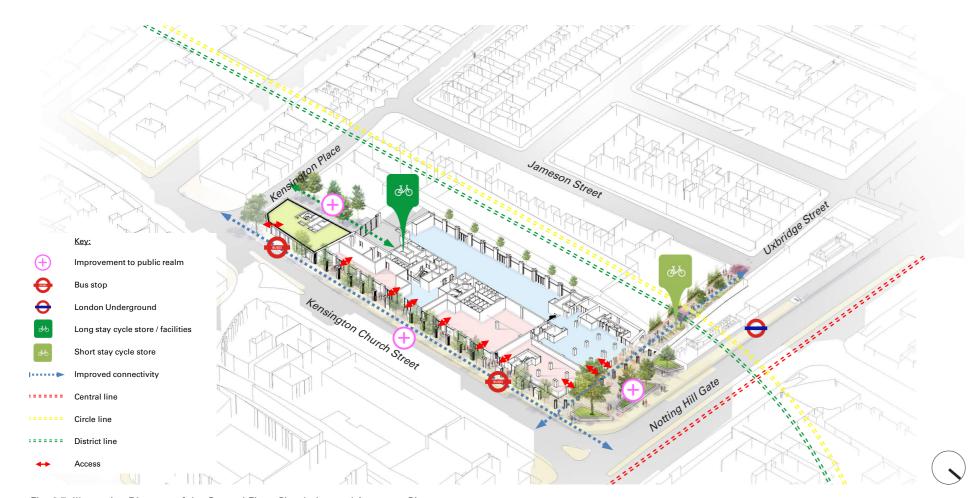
Illustrative Diagram of the Ground Floor Circulation and Access to Site
